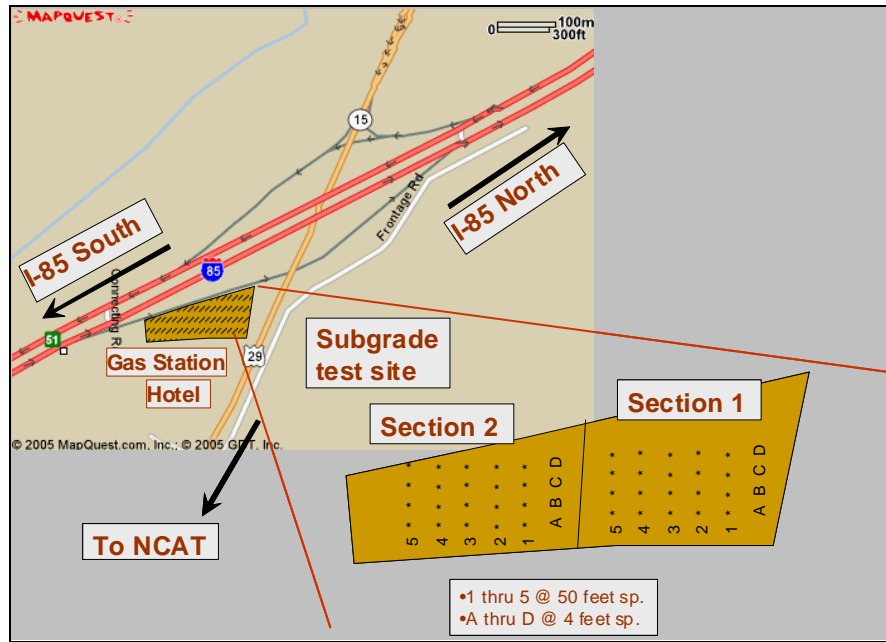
Embankment Test Locations and Section Layout for Exit 51 Ramp of I-85 North; Near Auburn, Alabama (Map courtesy Mapquest™)
